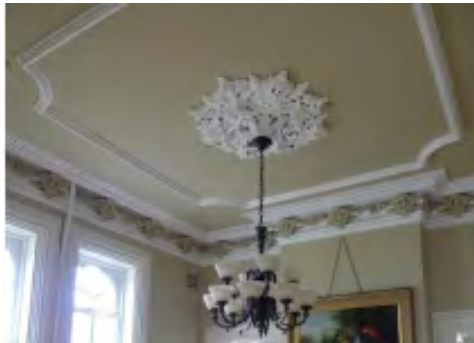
Decorative plaster ceiling in Center West Parlor M206
